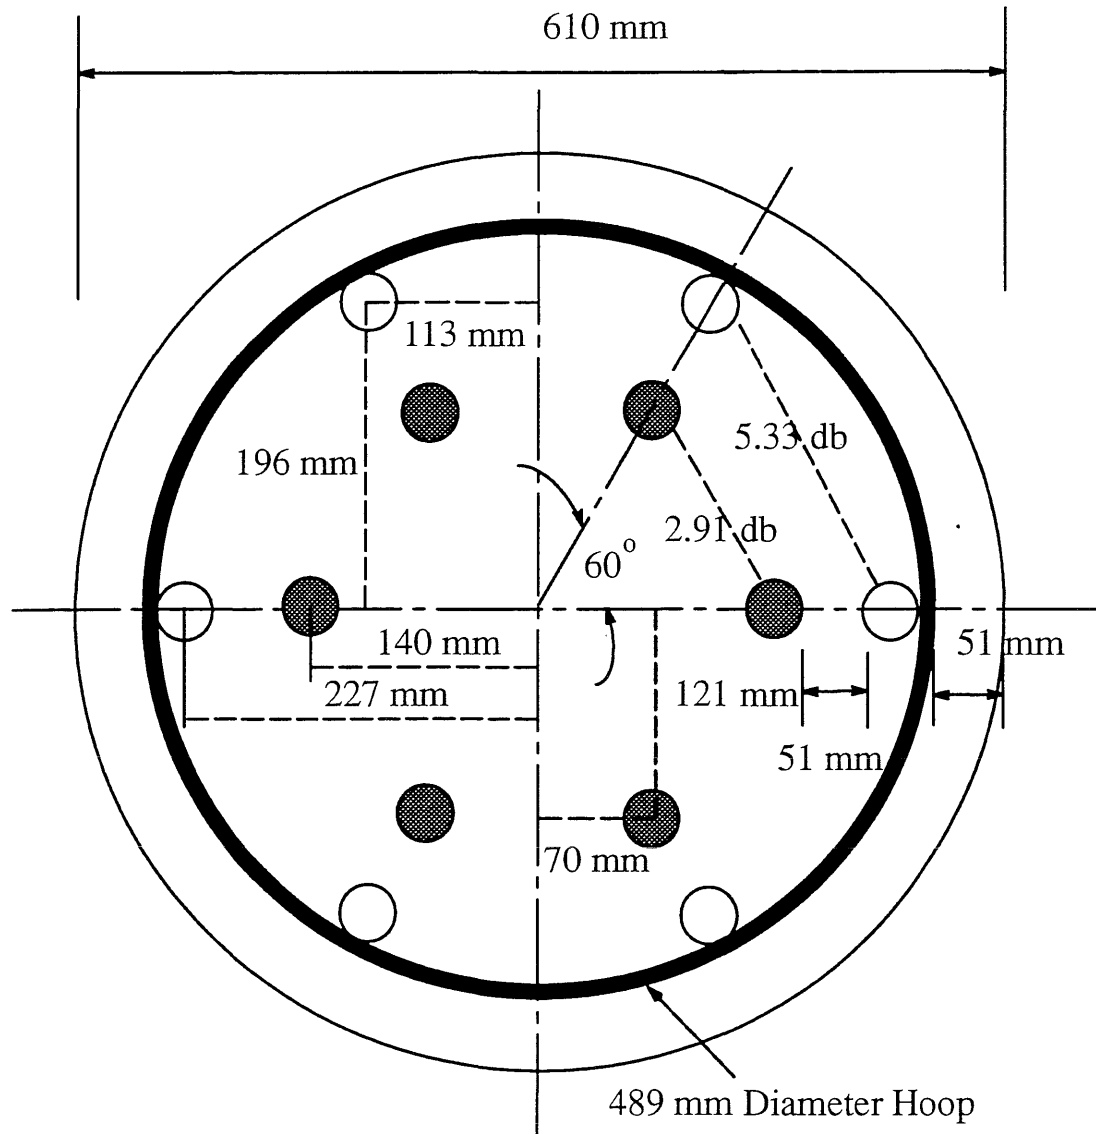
Cross Section for Column B-3(L=C=51 mm)
